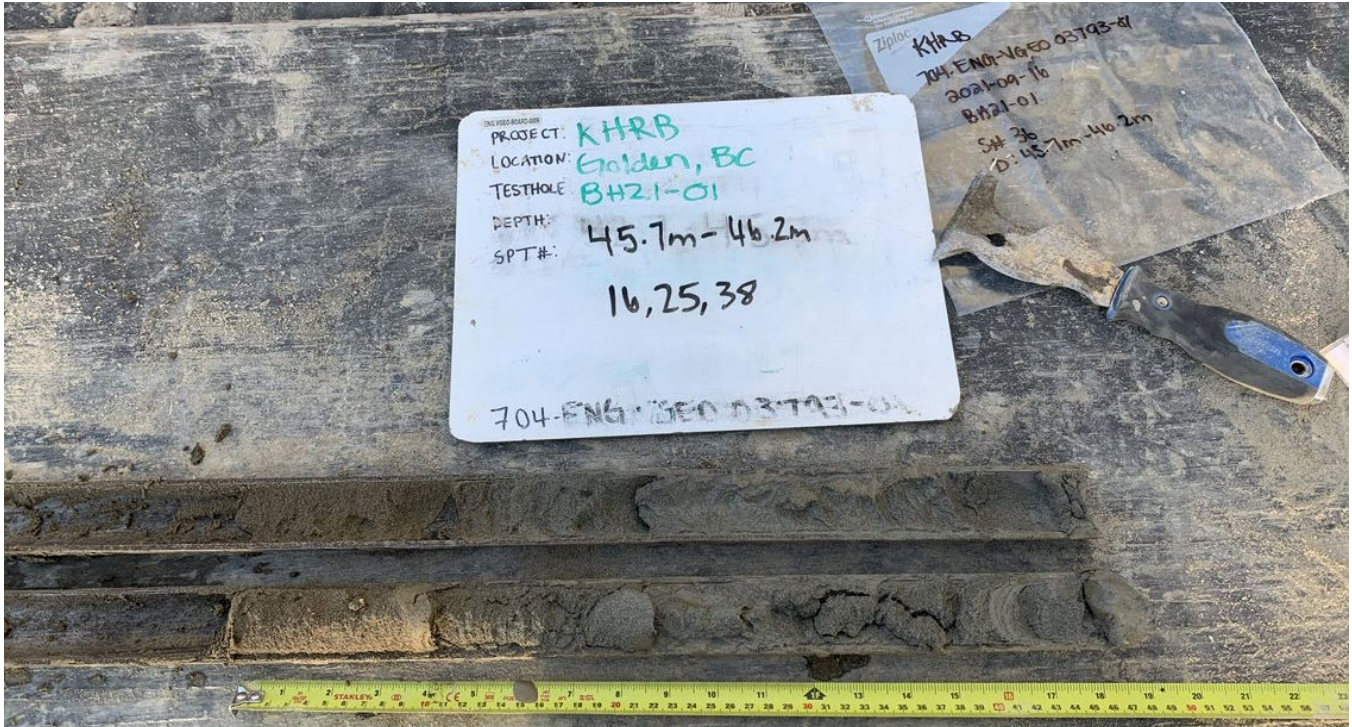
BH21-01, SPT-19, 45.7 m to 46.2 m
